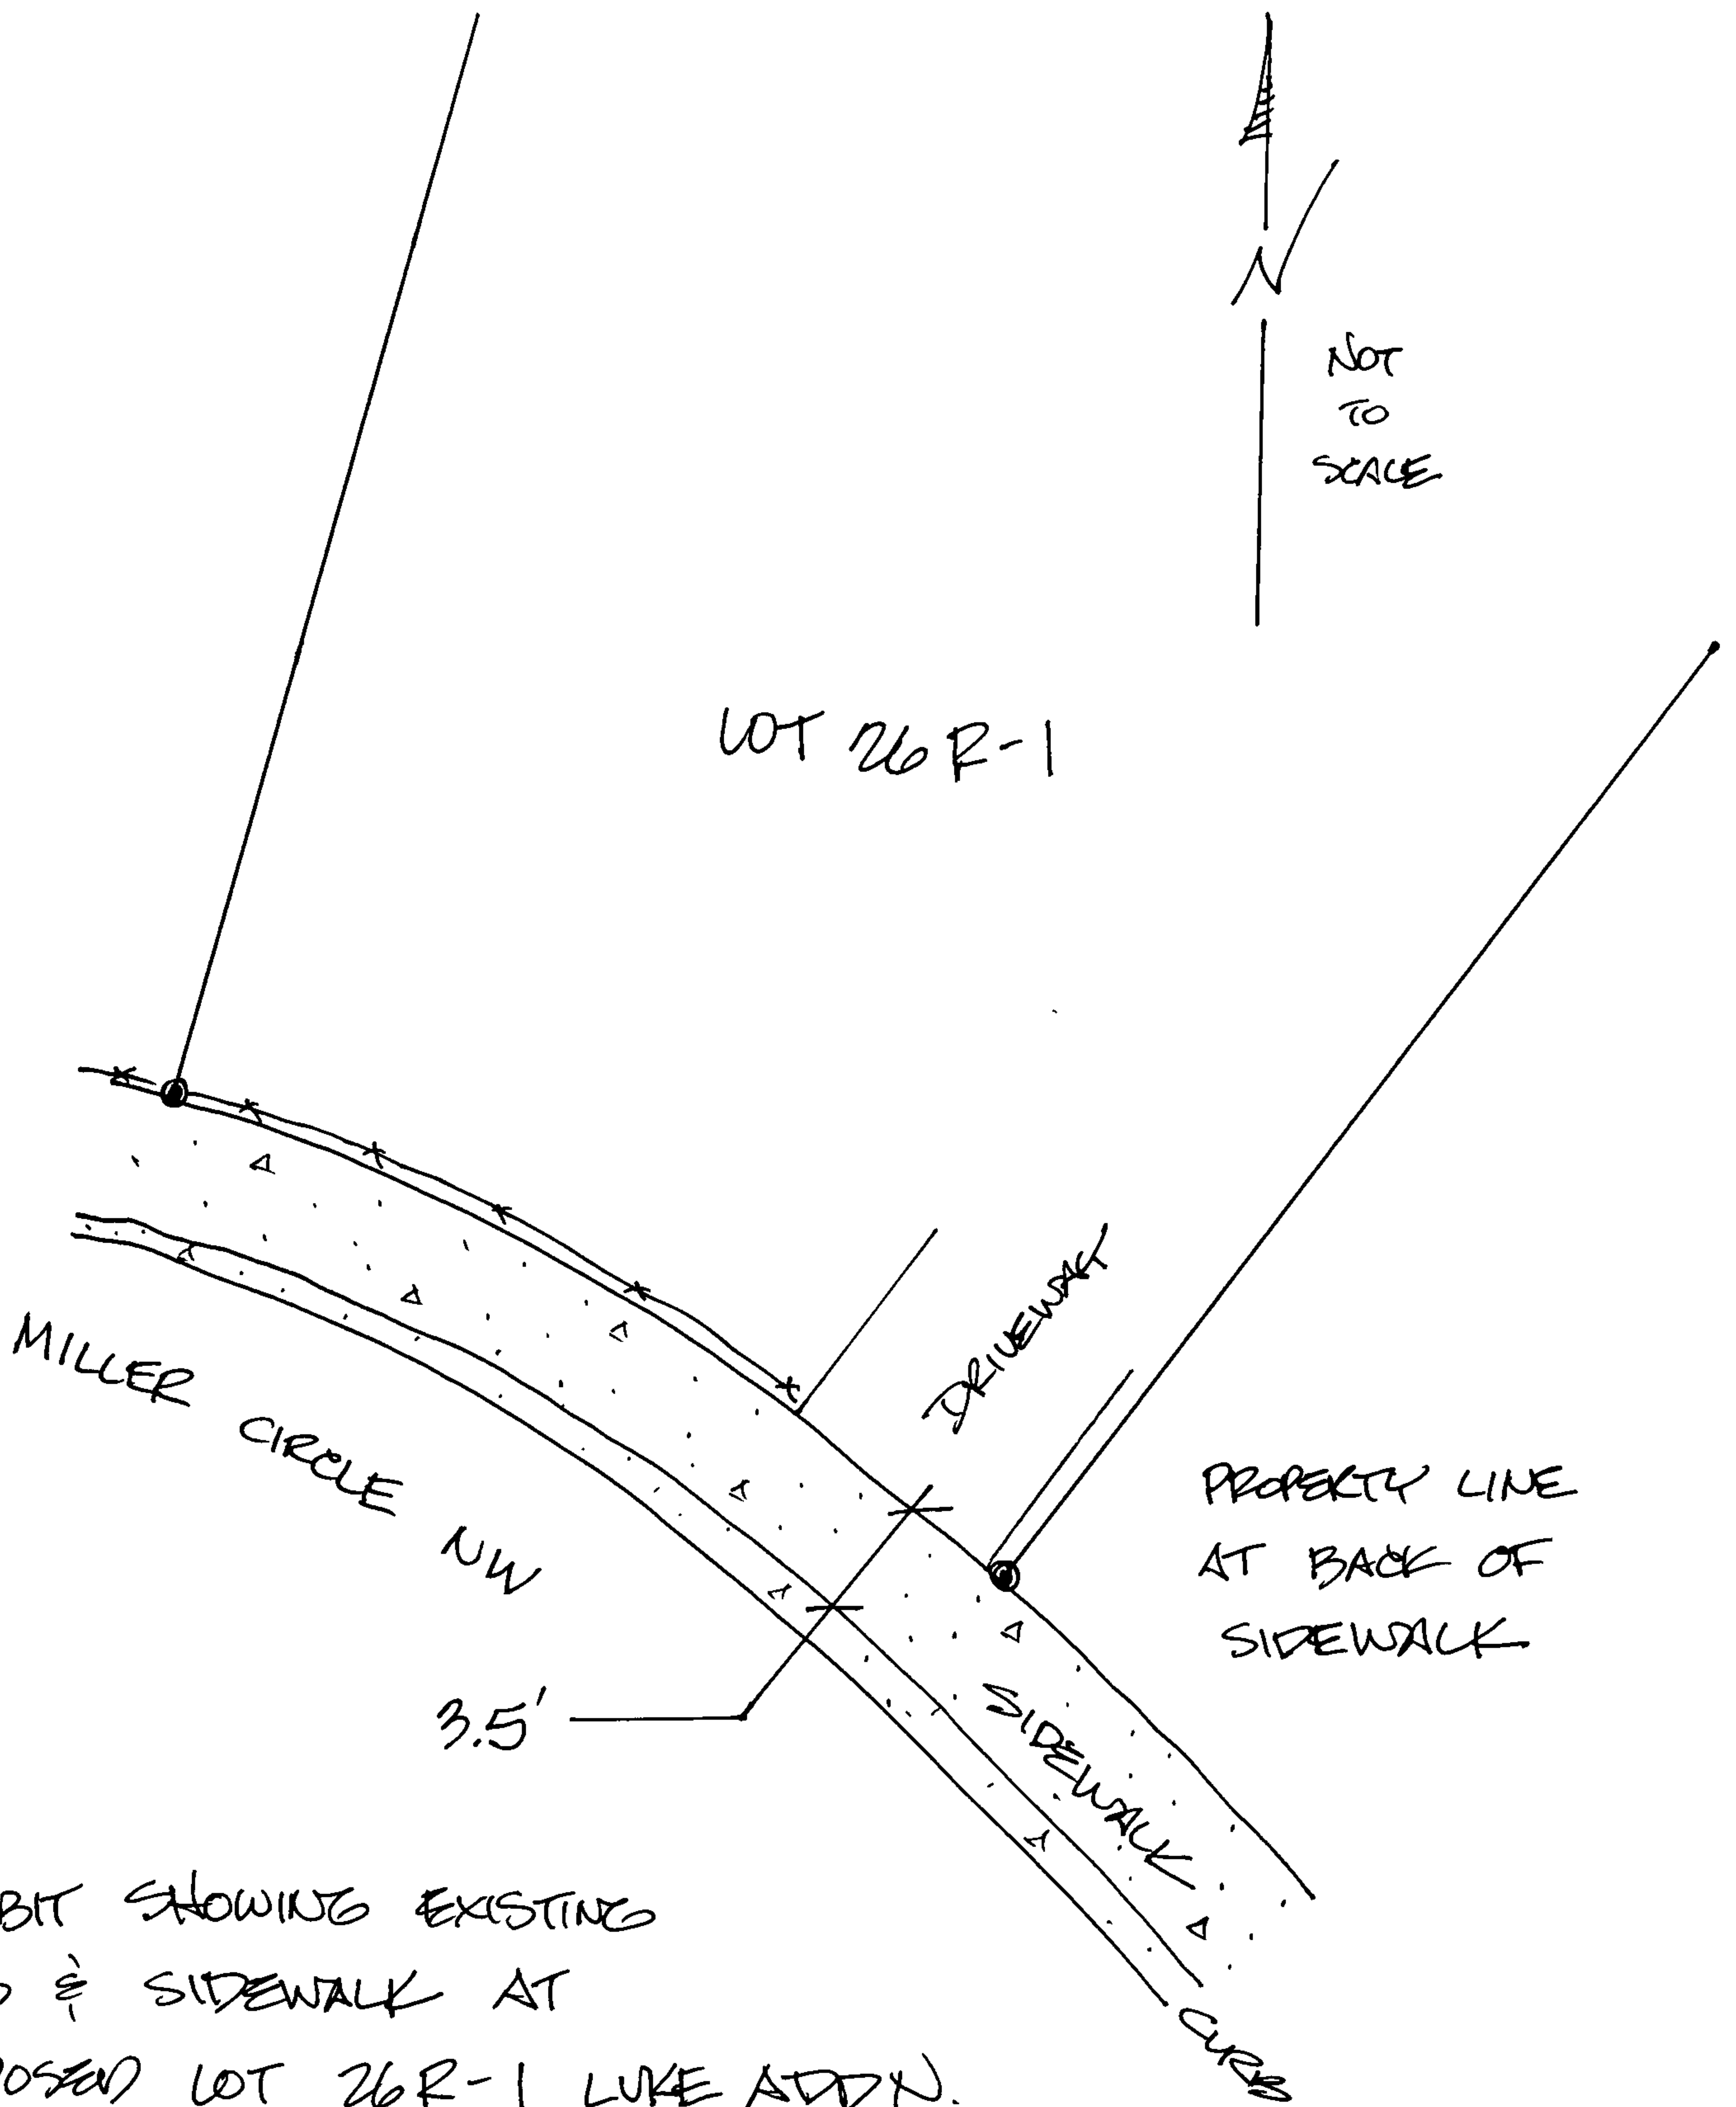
EXHIBIT SHOWING EXISTING CURBS & SIDEWALK AT PROPOSED LOT 26 R-1, LUKE ADDN. (TO ACCOMPANY FINAL PLOT SUBMITTAL).
